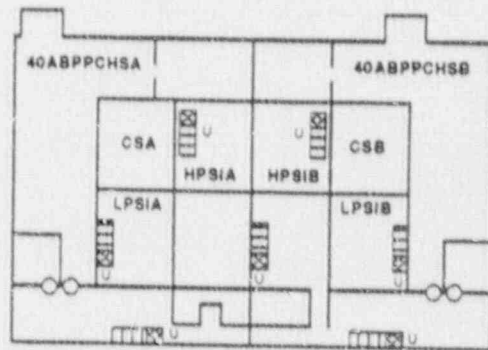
Palo Verde Power Block (Except Turbine Building), 40 ft. Elevation
